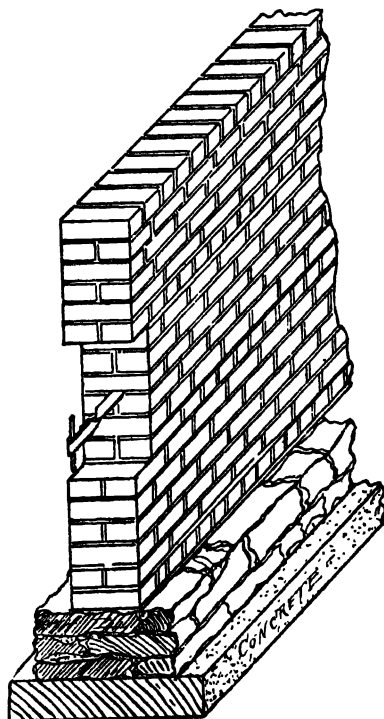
,335.—Eight inch inside wall showing anchor built into recess for tying corner or intersecting wall.
